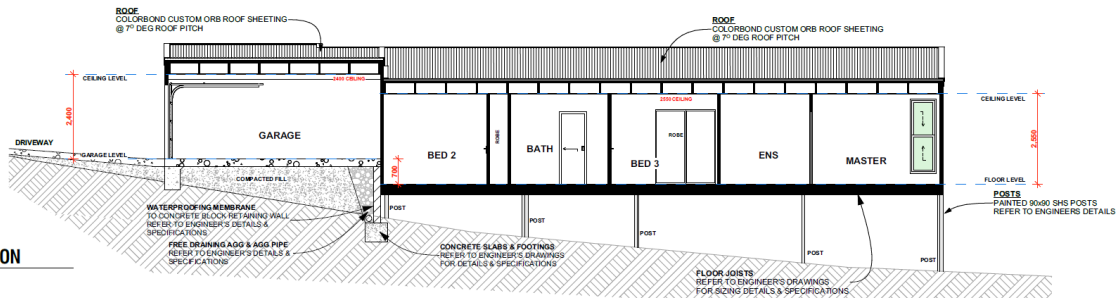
Proposed modernised section and sub floor detail (typically) (refer also to full set in the attached separate annexures).
